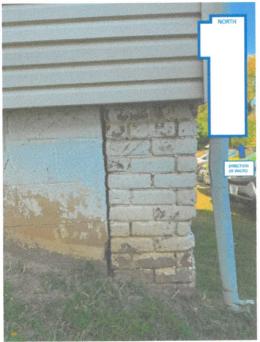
Perimeter piers with gaps between CMU infill and piers being larger at top.
